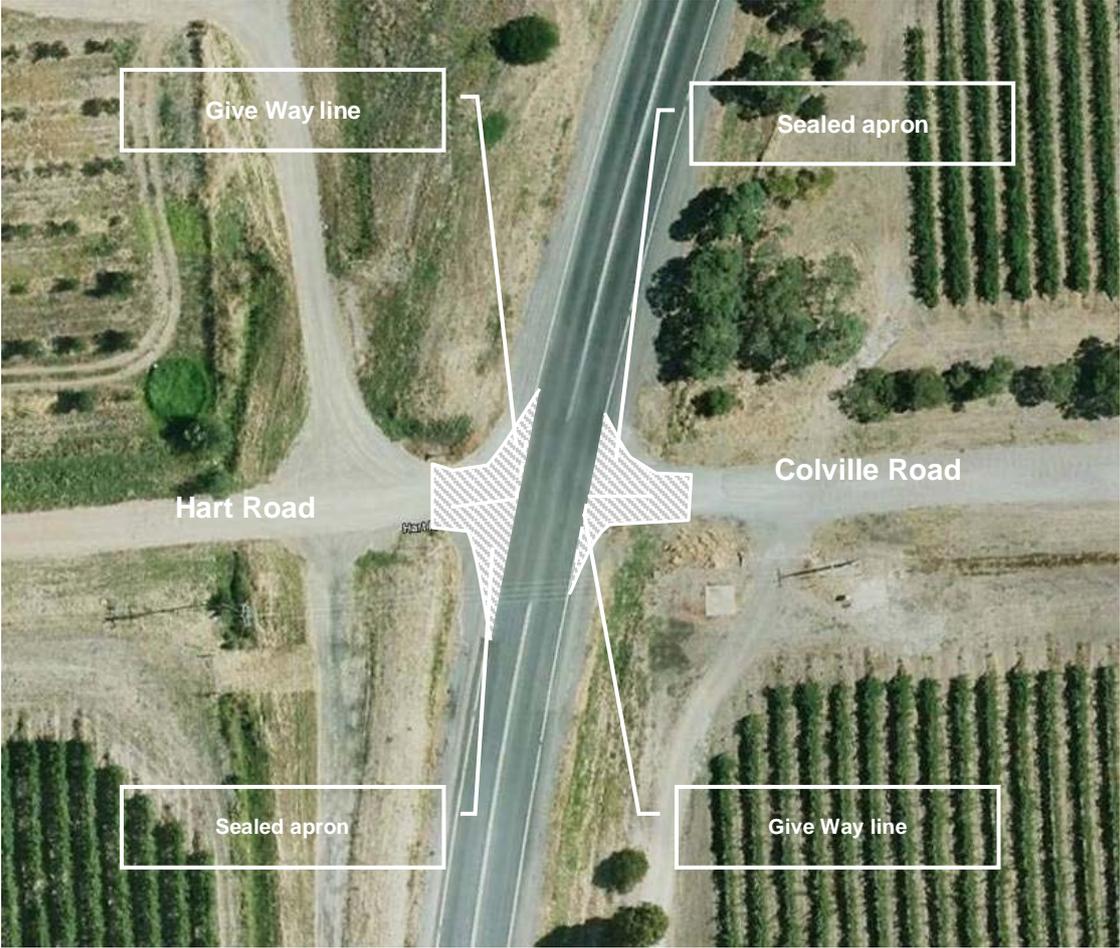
Proposed Upgrades for Hart Road/Colville Road Intersection: – Sealed aprons and Give Way lines
